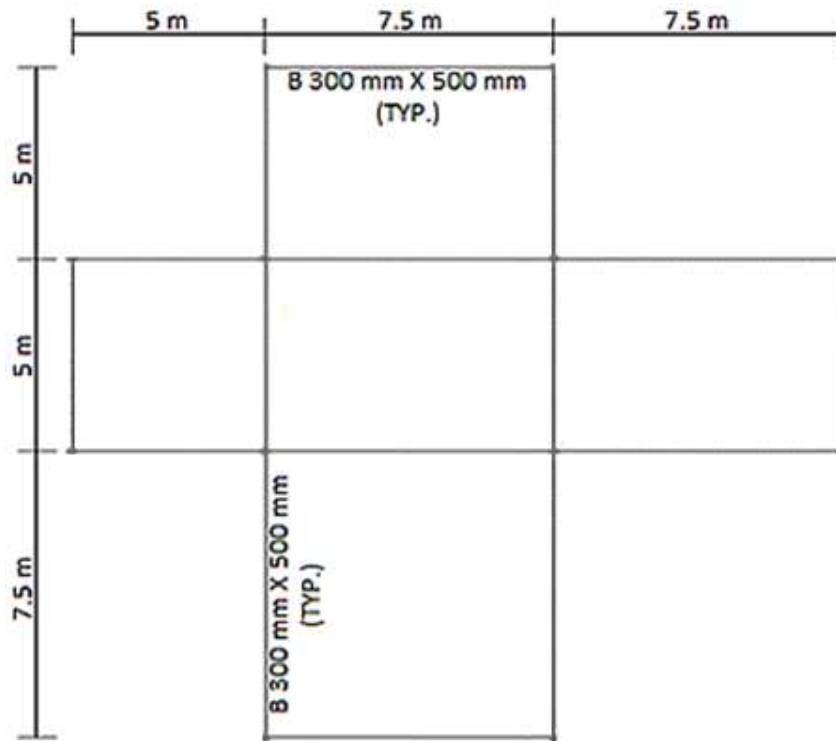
6th and 7th floor plan of the building with vertical irregularity as well as typical floor plan of the building with horizontal irregularity
